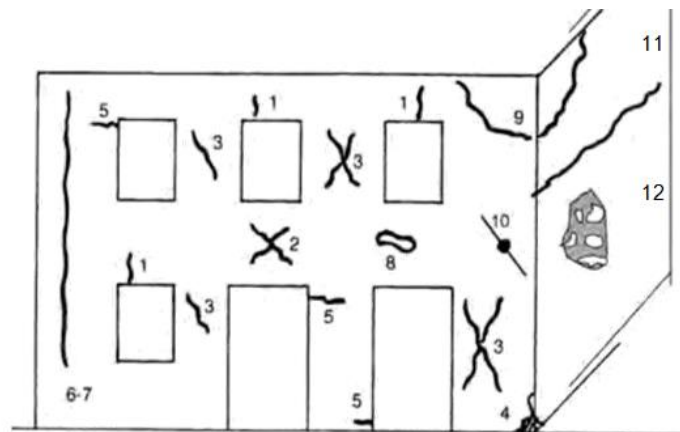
Reference scheme for masonry damage - AeDES
